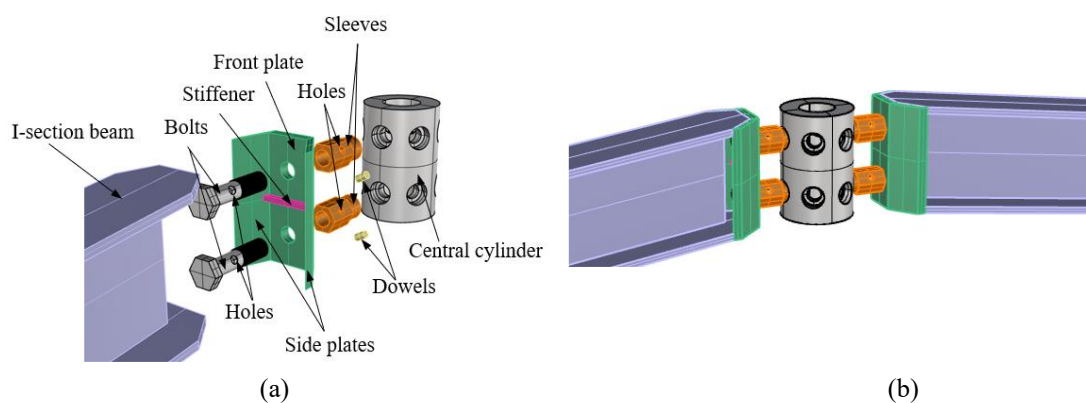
The configuration of the new assembled joint: (a) joint components, and (b) joint assembly
